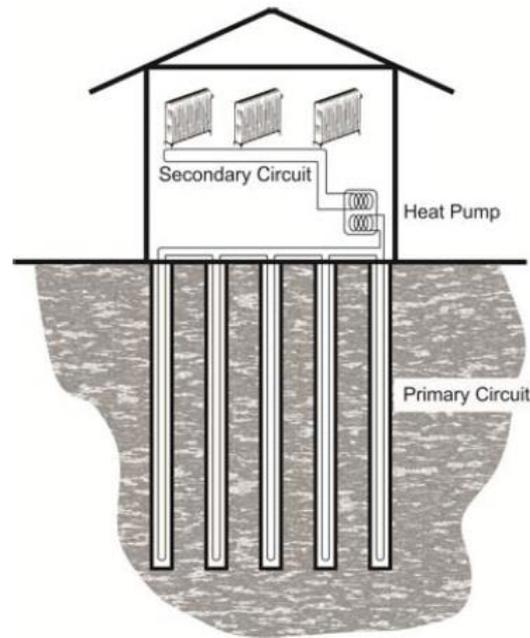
Building with thermal piles attached to heating system (Loveridge et al., 2018).
